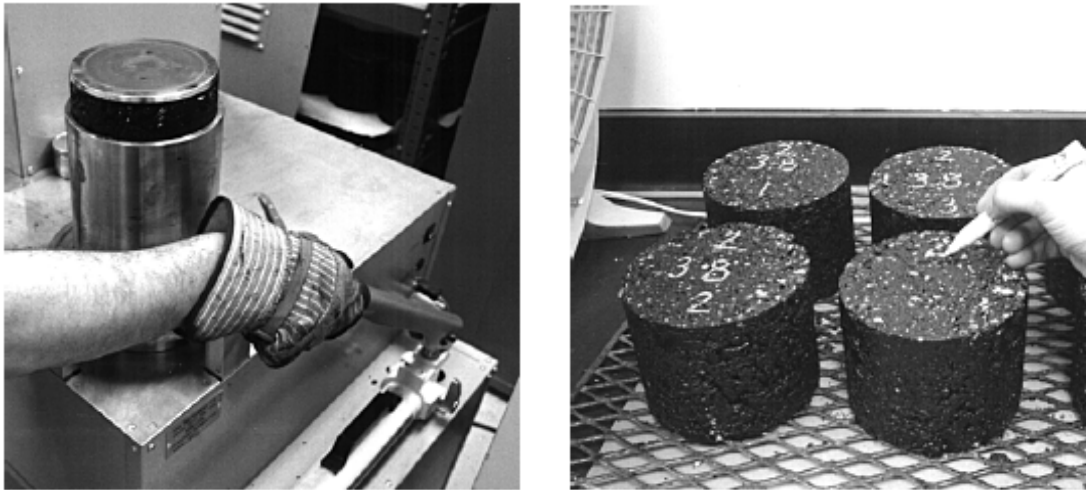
Demolding and cooling of asphalt concrete specimens.
